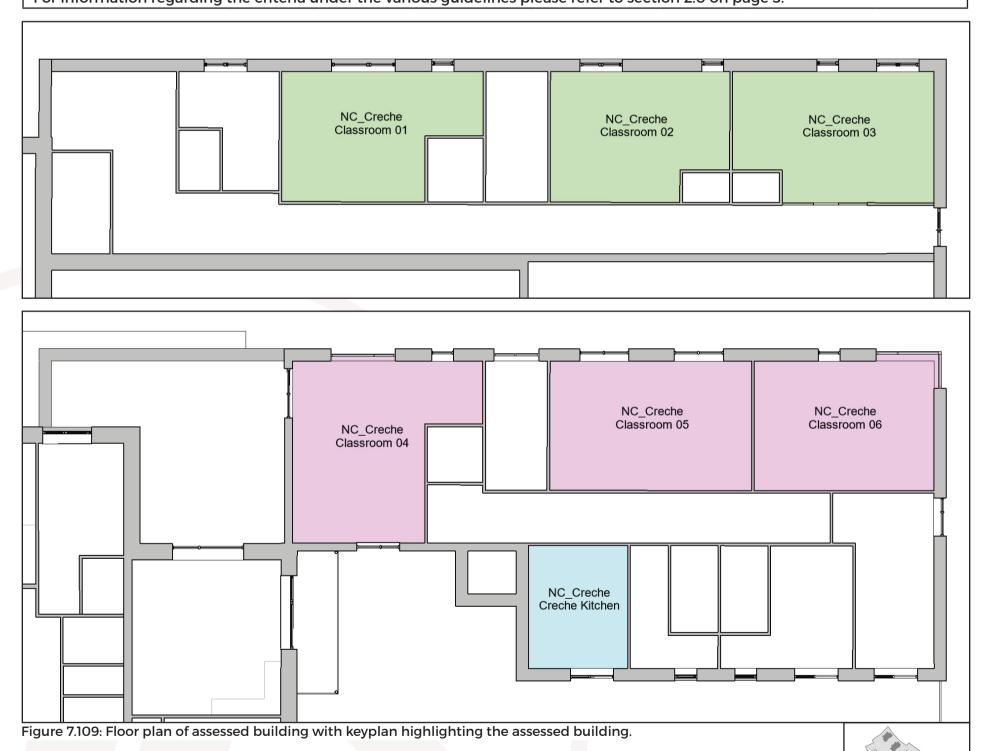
Floor plan of assessed building with keyplan highlighting the assessed building.
